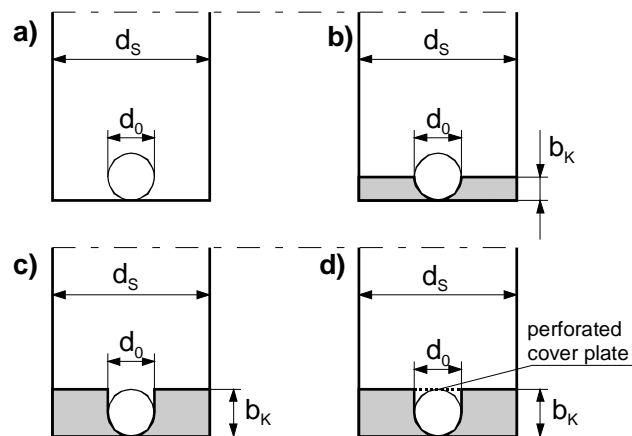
Sewer manhole benching types: a) flat bottom, b) half benching, c) full benching, d) full benching with perforated cover plate
